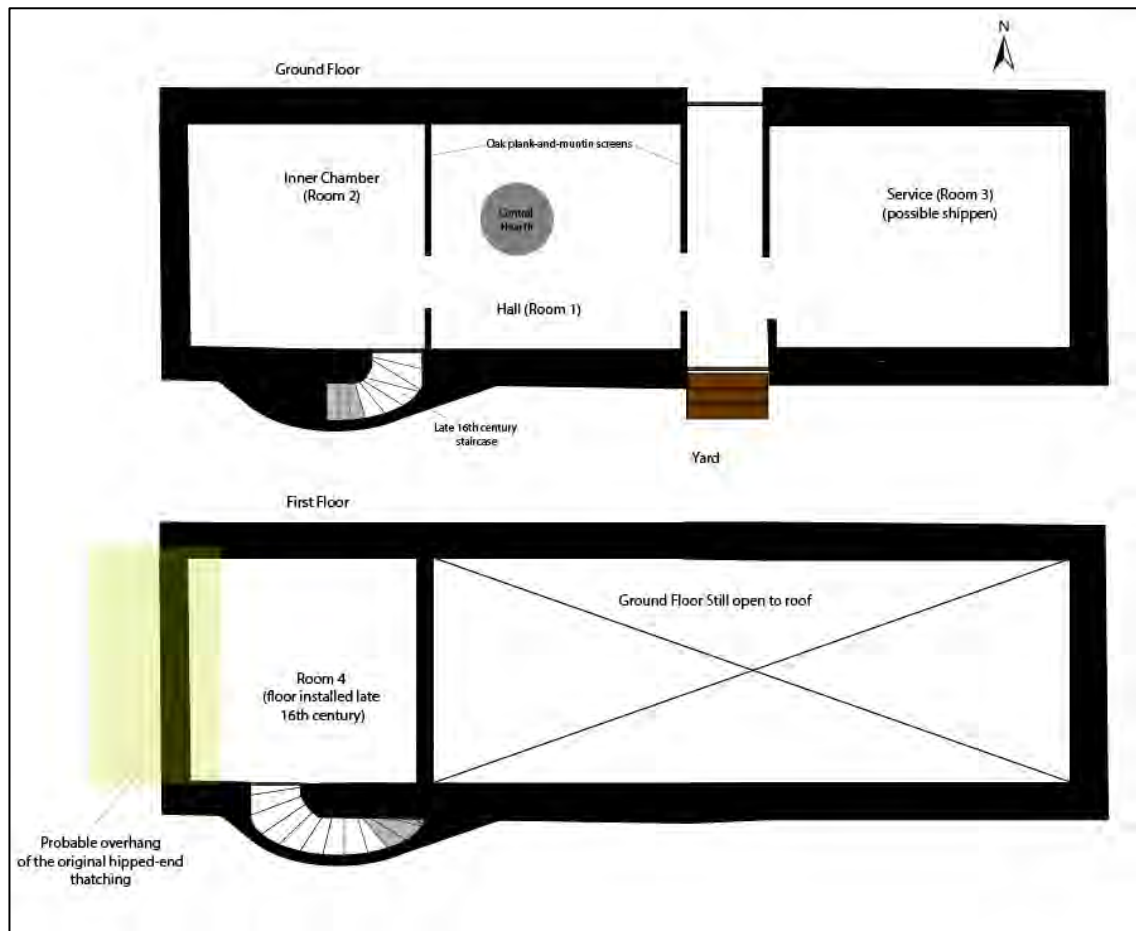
Phase 1 hall house plan - The late medieval Hall House (not to scale).
